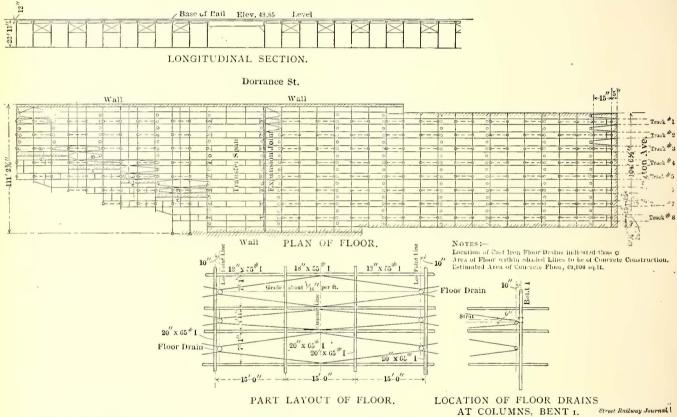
PLAN AND SECTIONS OF REINFORCED CONCRETE FLOOR, SULLIVAN SQUARE STORAGE YARD, BOSTON
